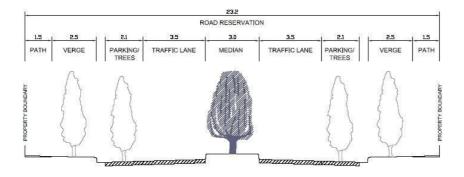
(c) Port Sorell and Environs Street Cross-section designs - Alexander Street, South of Hawk Hill Road
